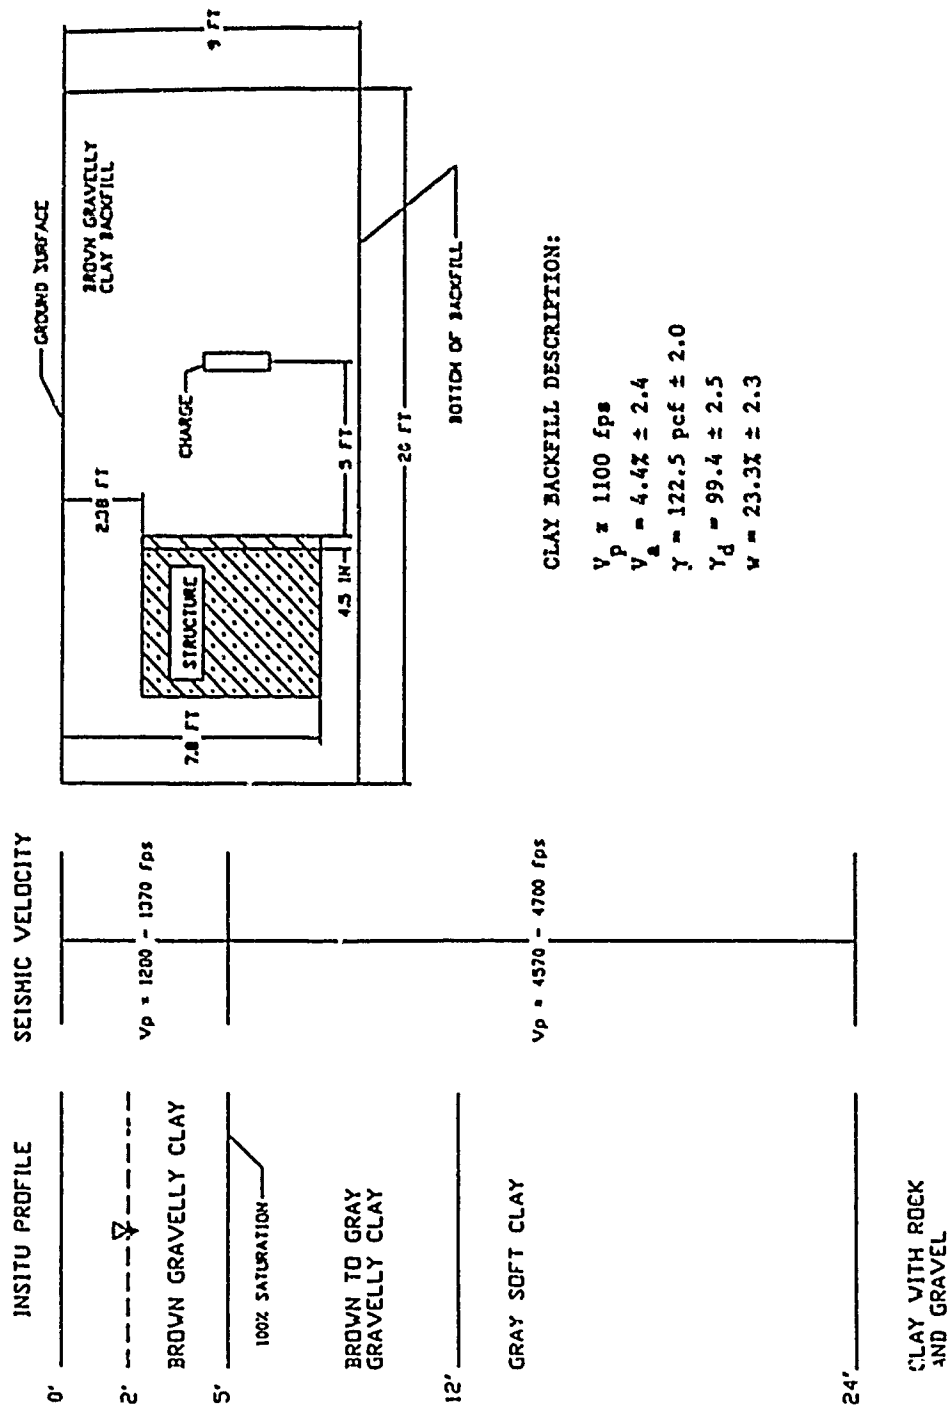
Section through Backfill Test 1 test bed and in-situ profile.
